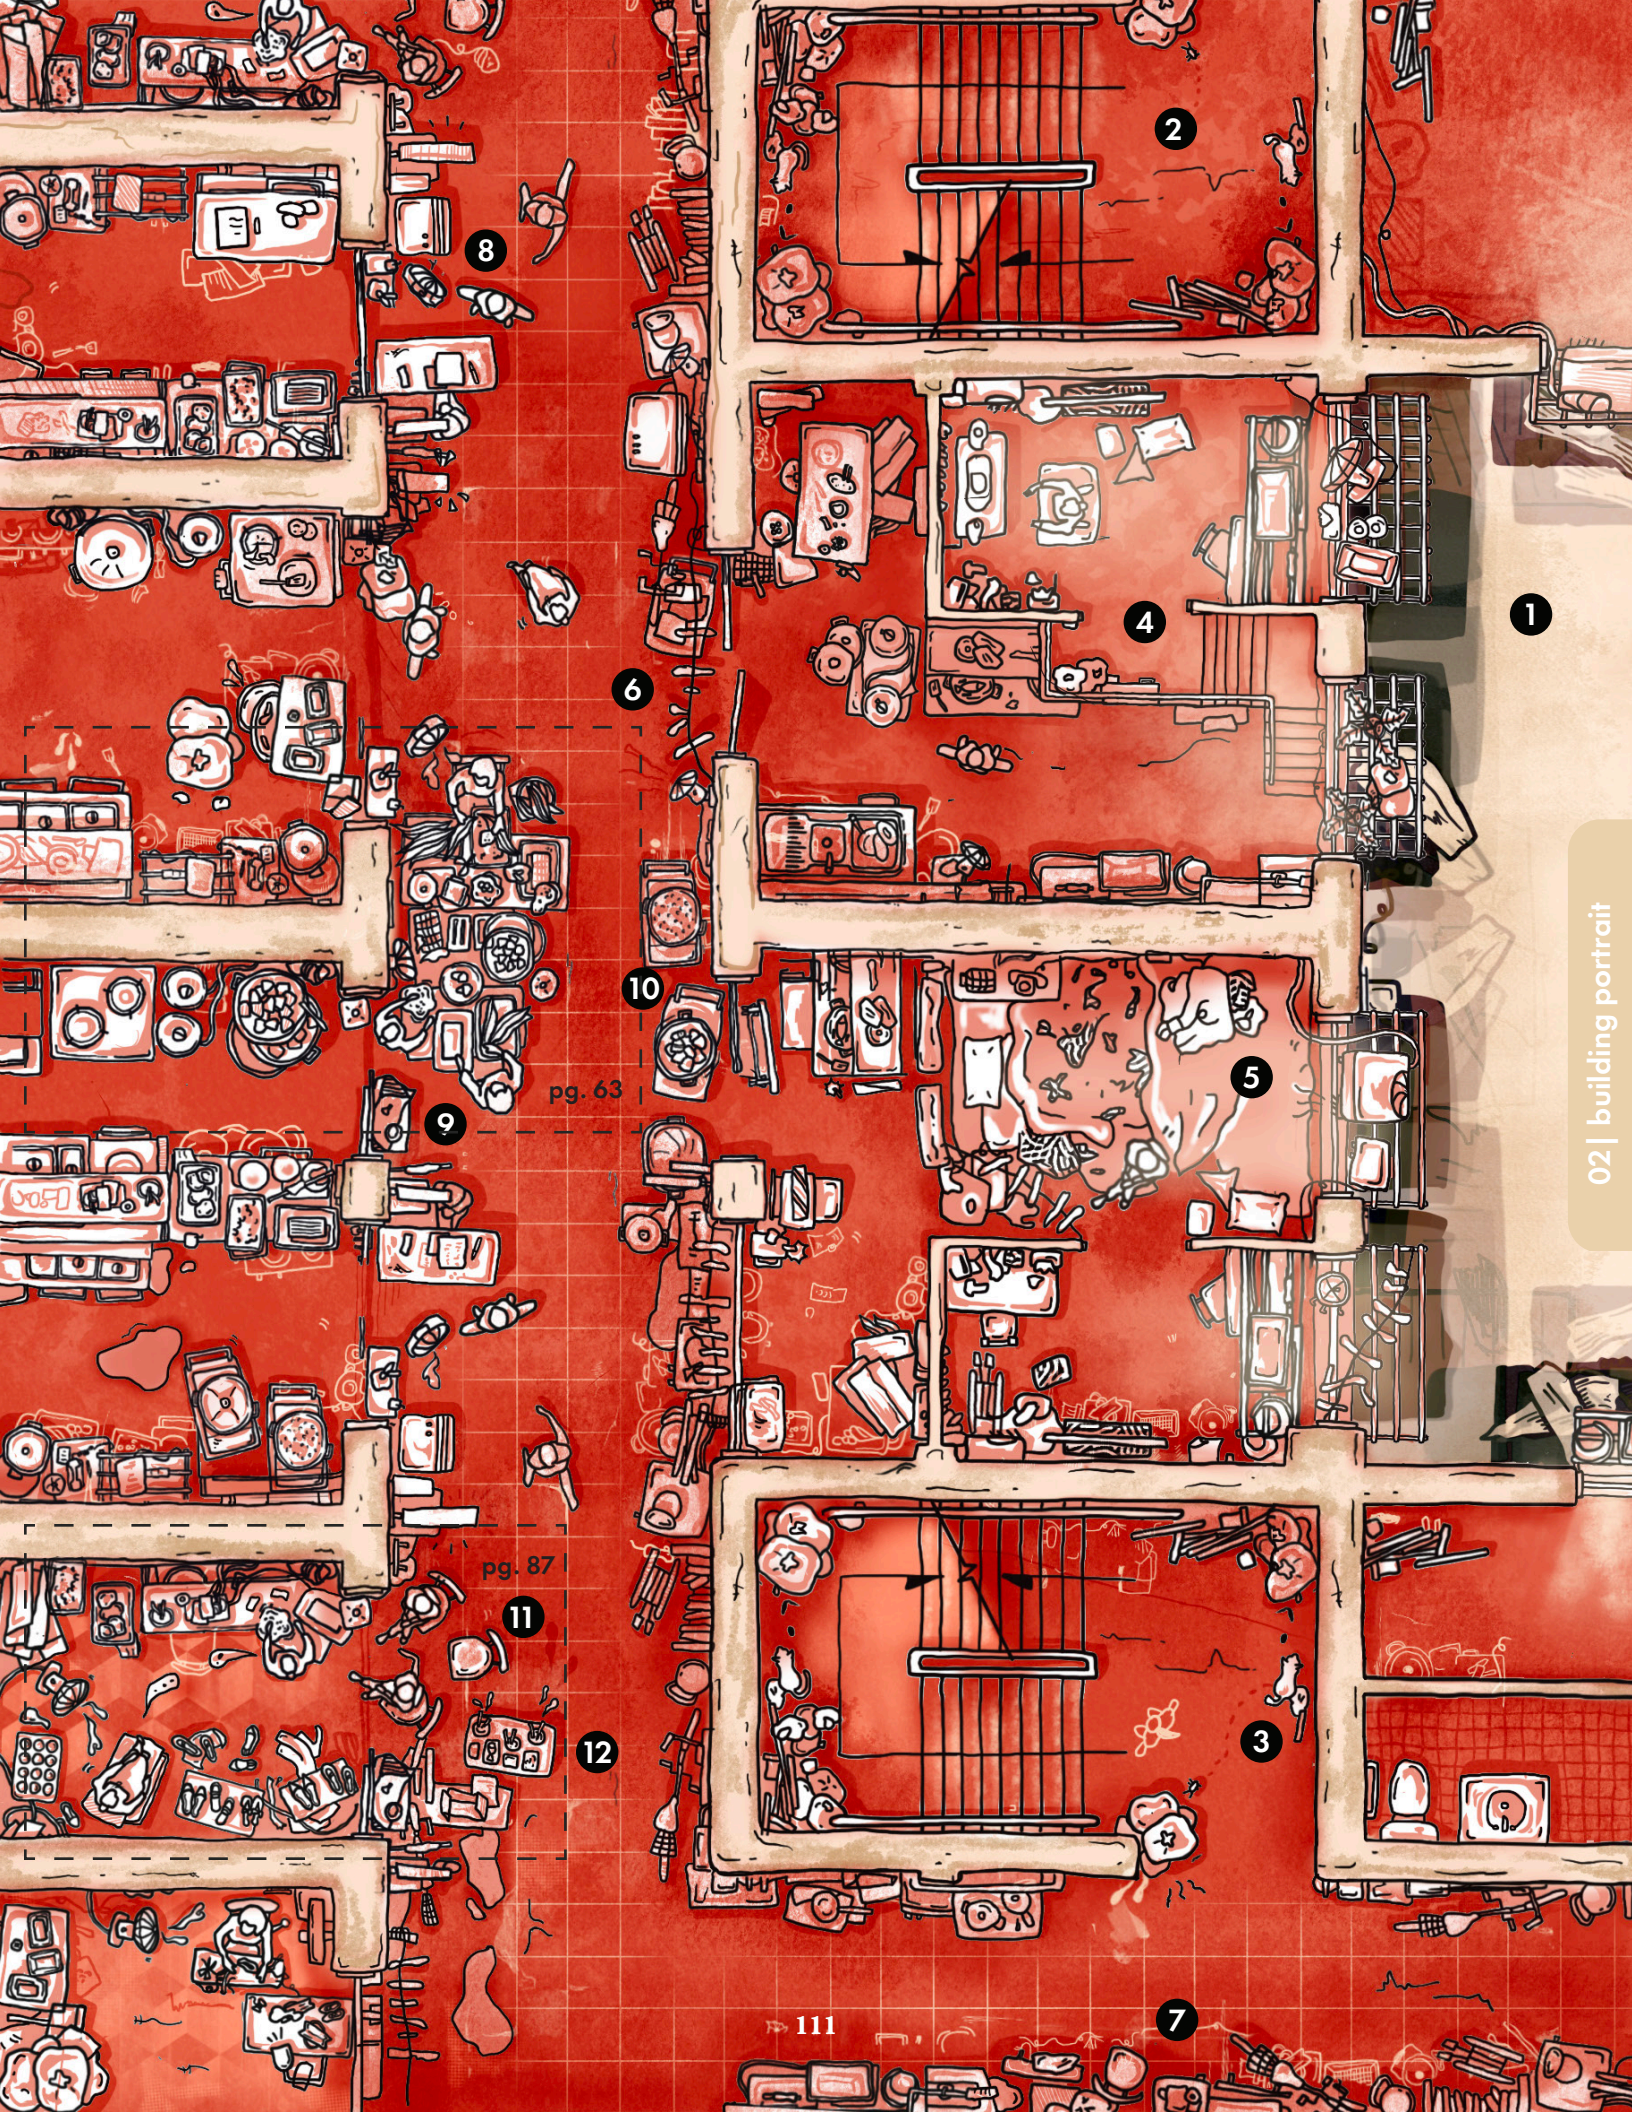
The plan of the Xinwei Building's second floor corridor
